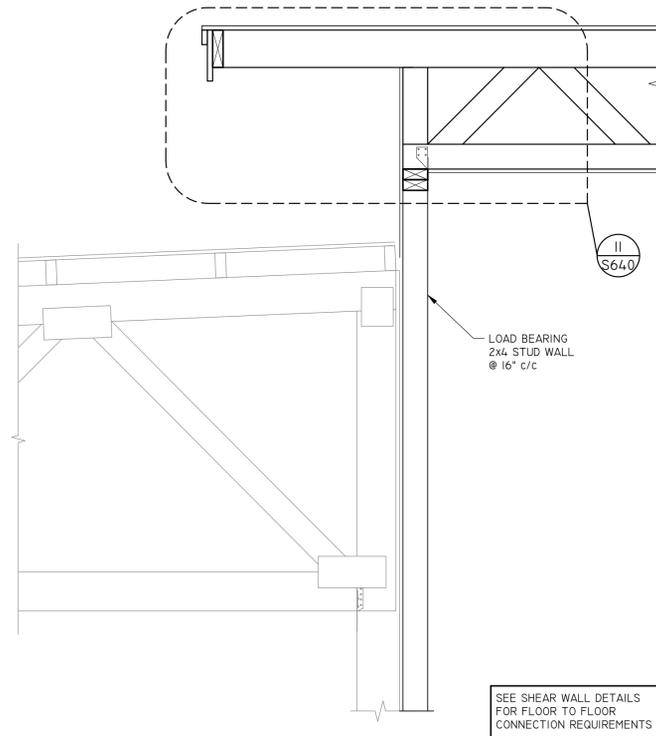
DETAIL: TYPICAL TOP PLATE SPLICE AT ROOF AND SECOND FLOOR
